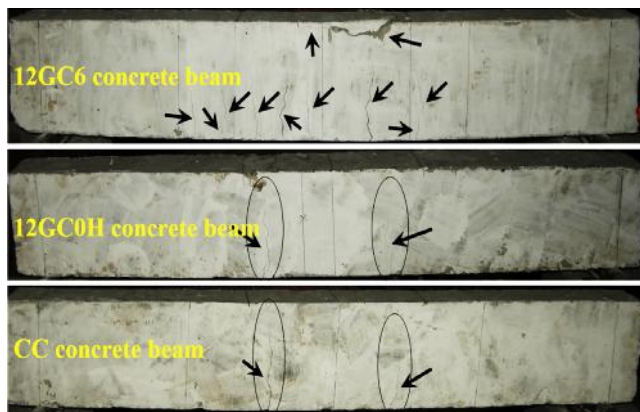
Crack pattern of 12M6 & 12M0H geopolymer concrete and CC concrete beams.
